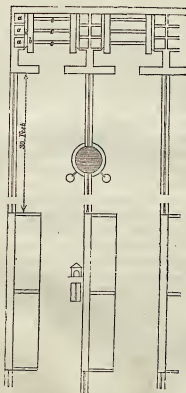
Elevation and section of storm-house, and dry-bath house.
